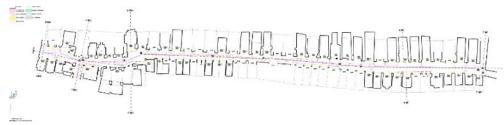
Floor Plan of Eski Demirciler and Kunduracılar Bazaar
